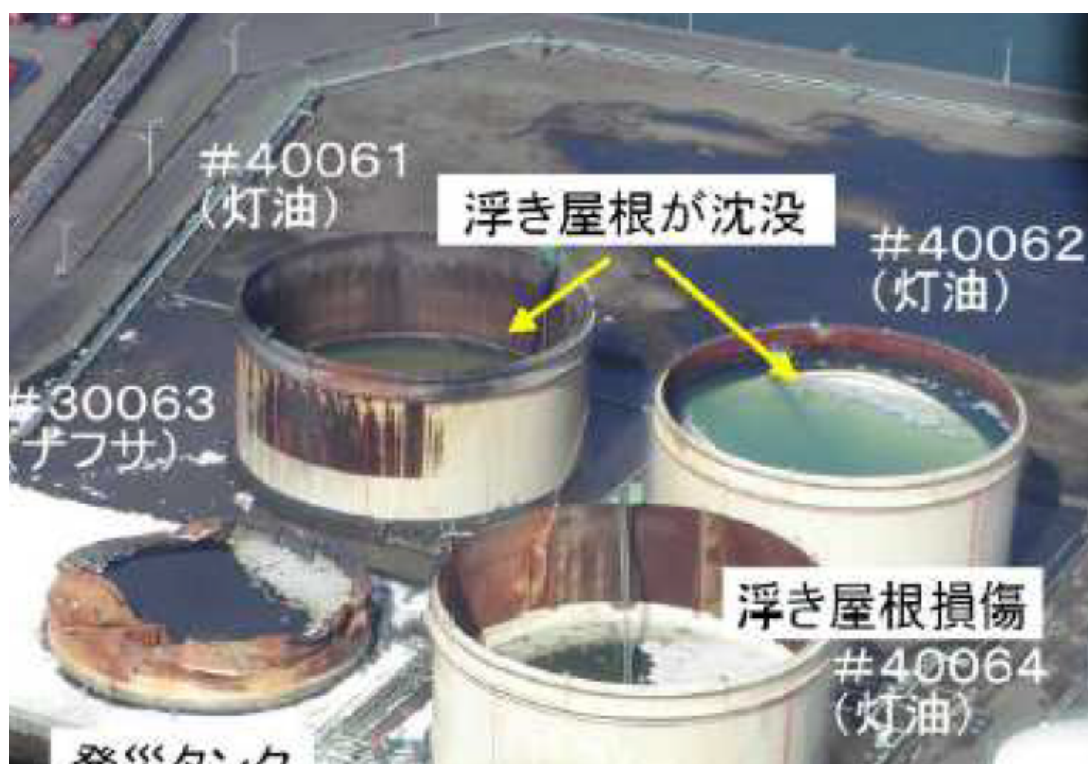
Sliding of floating roof. Tokachi-oki (Japan) earthquake 2003, M 8.3.
